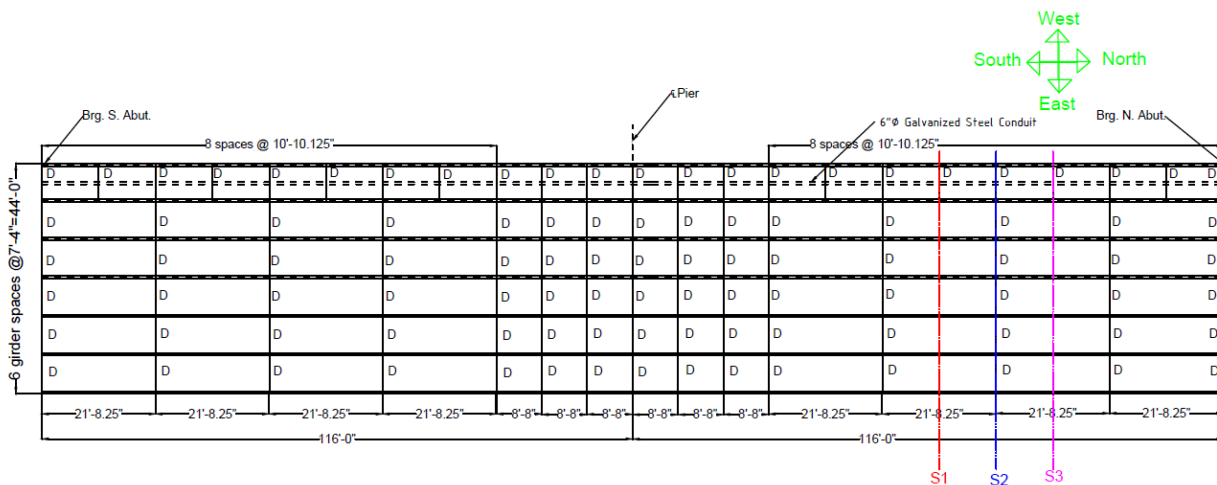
Plan of the Bloomington bridge and the chosen sections for instrumentation.
